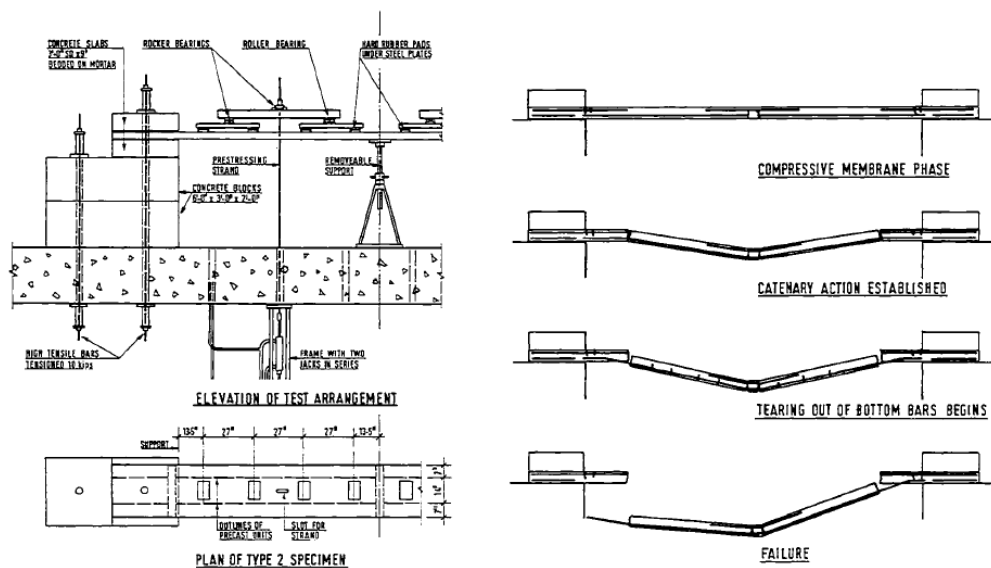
Catenary action tests of precast floor strips (Regan 1975)
